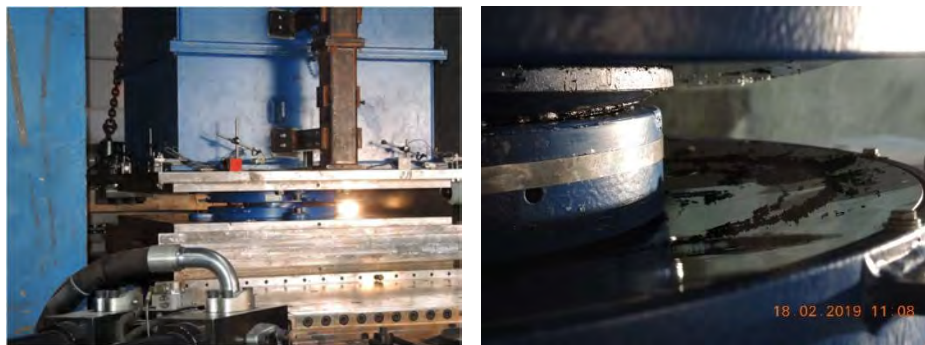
Test on the EUCENTRE Bearing Tester through hybrid testing technique
